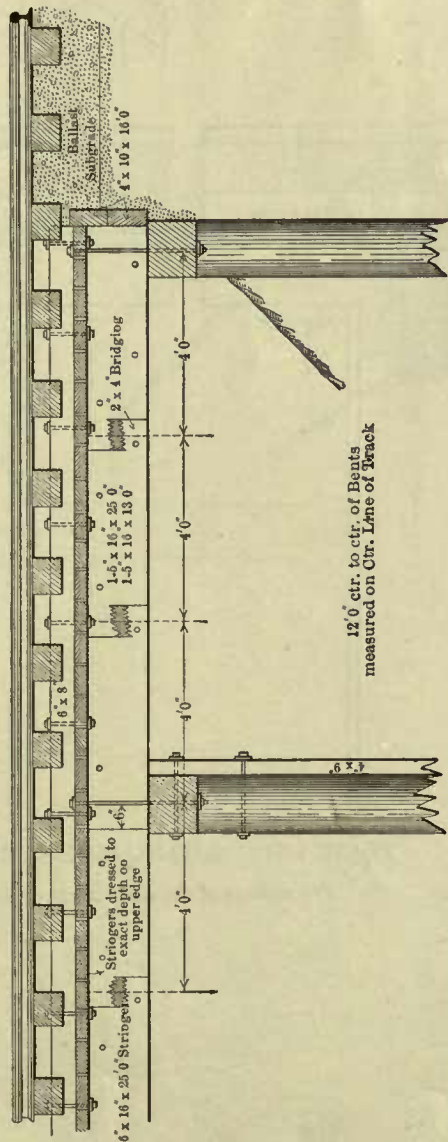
PLATE LXIII.—BALLASTED FLOOR TRESTLE, LOUISVILLE & NASHVILLE RAILROAD.
